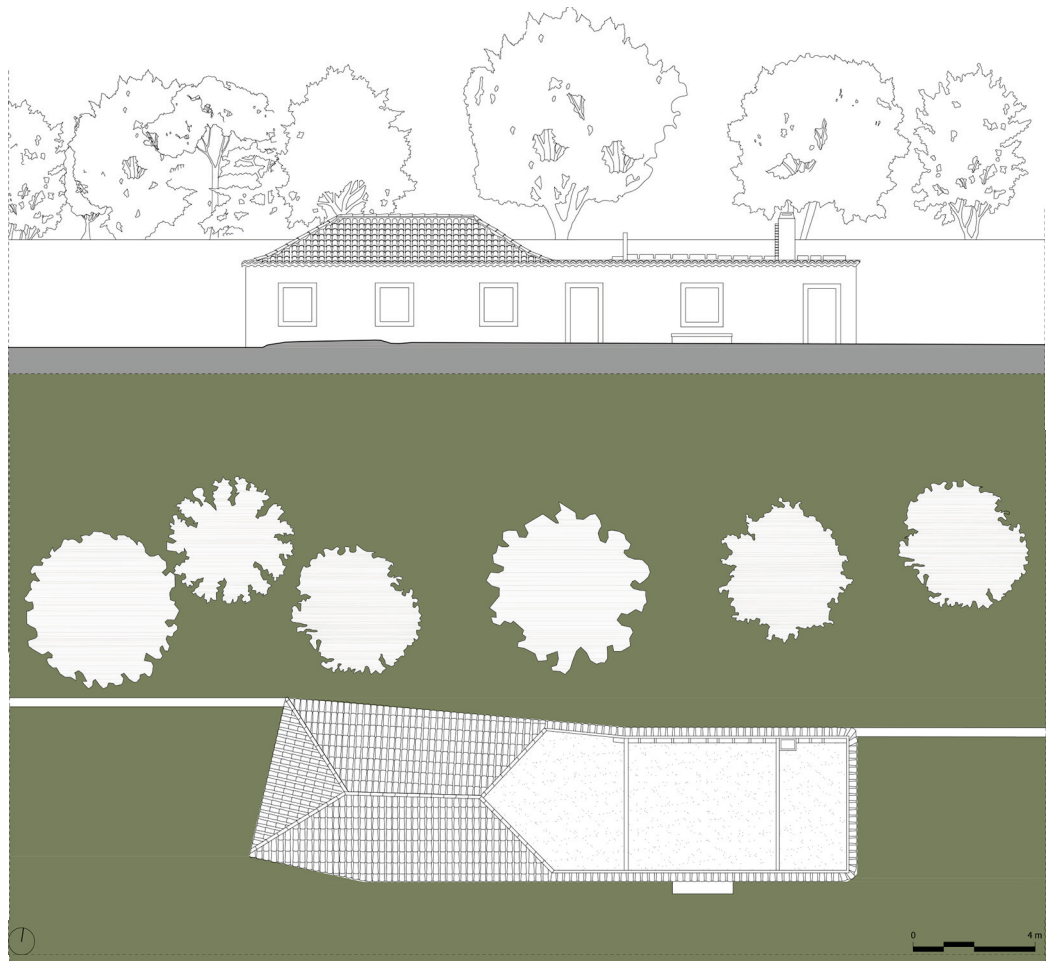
Quinta da Ribafria. Roof plan and south elevation of the stable.
